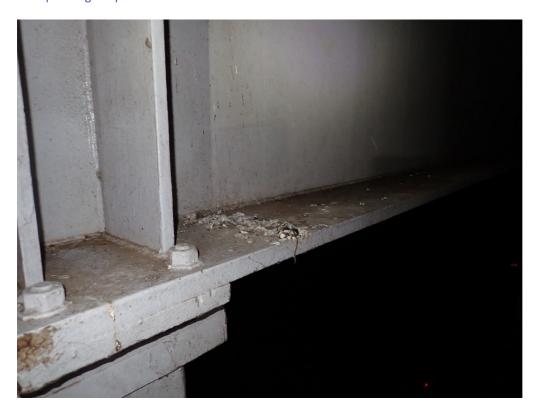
Bird dropping to the South edge beam adjacent the East Pier
